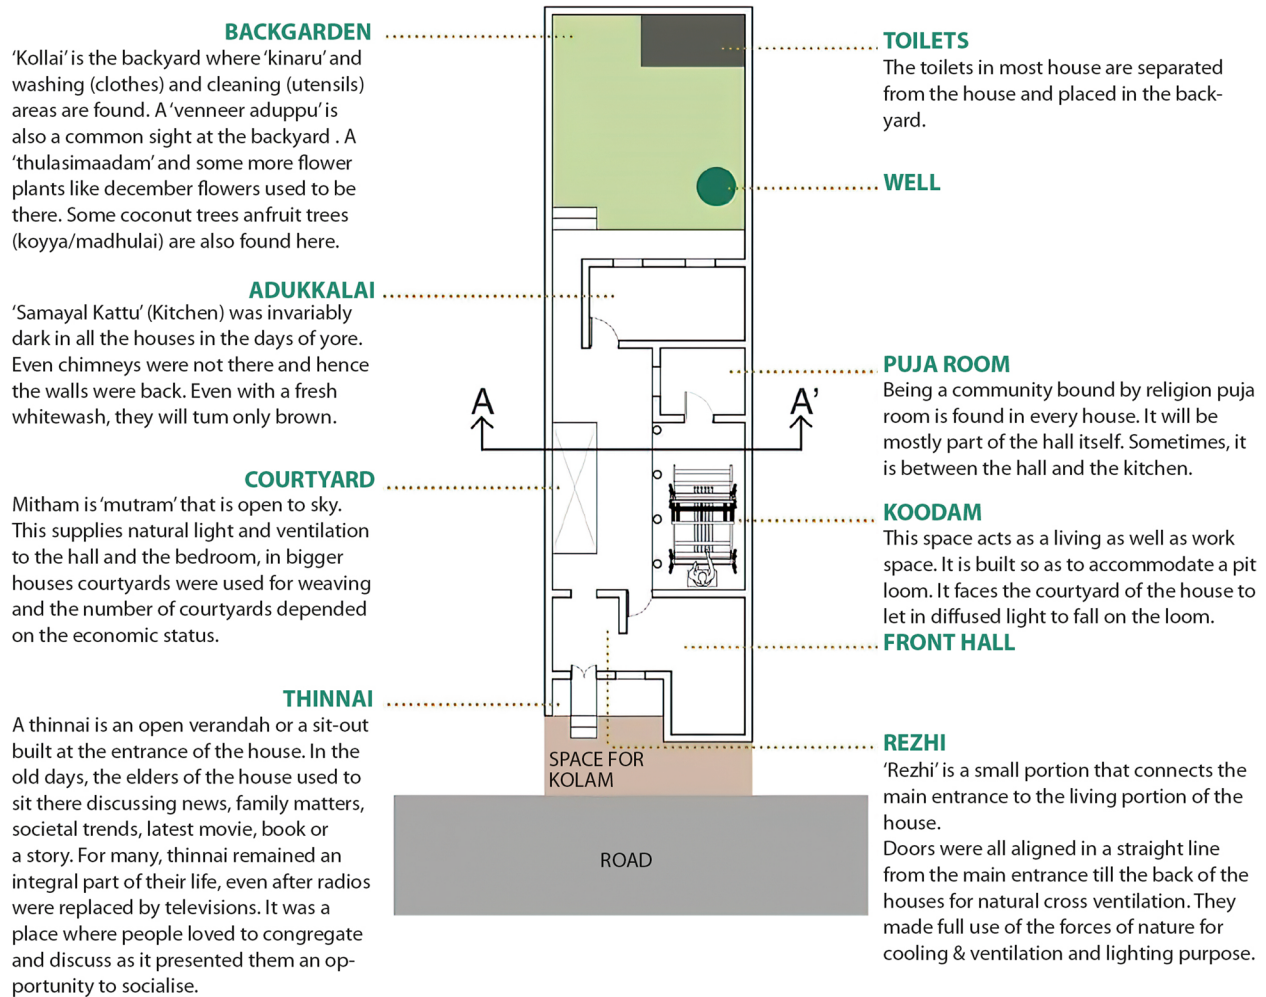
Floor plan of traditional single-family dwelling and its spatial characteristics (Source: the author)
